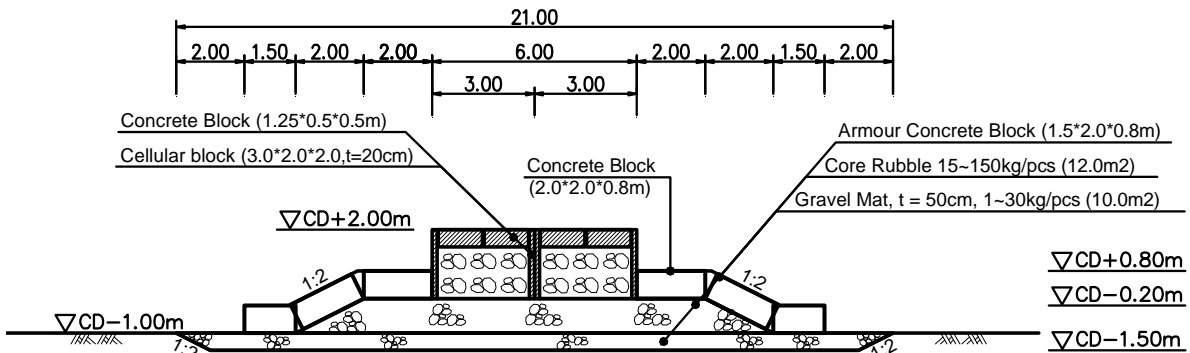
Typical Cross Section of Proposed Sand Protection Dyke – CASE A-2
